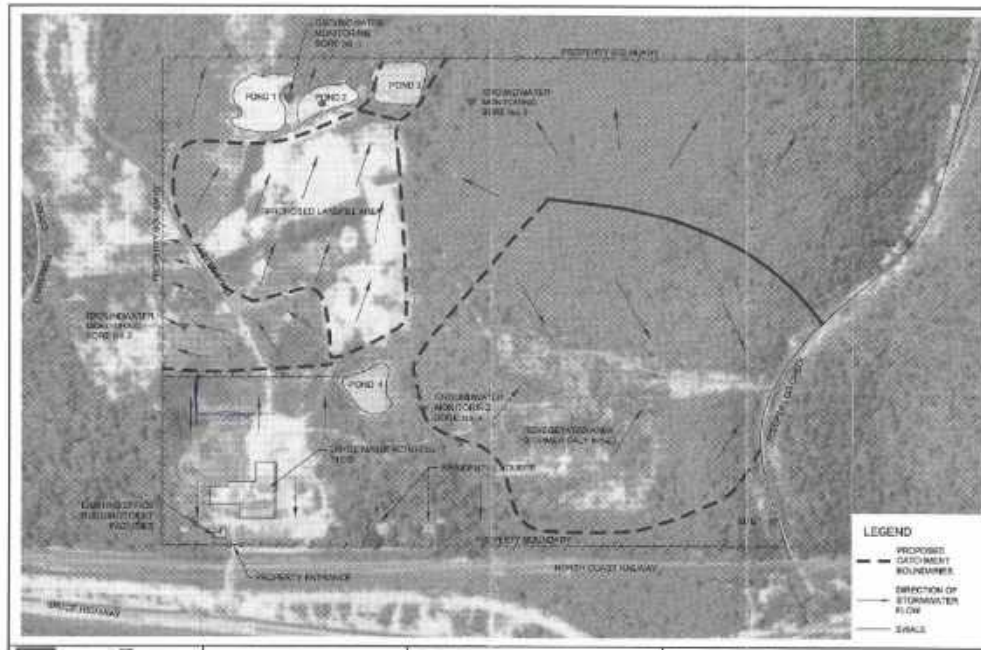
Stormwater Ponds and Swales (Source: SMP prepared by Langtree Consulting Engineers, refer to Appendix 8)
